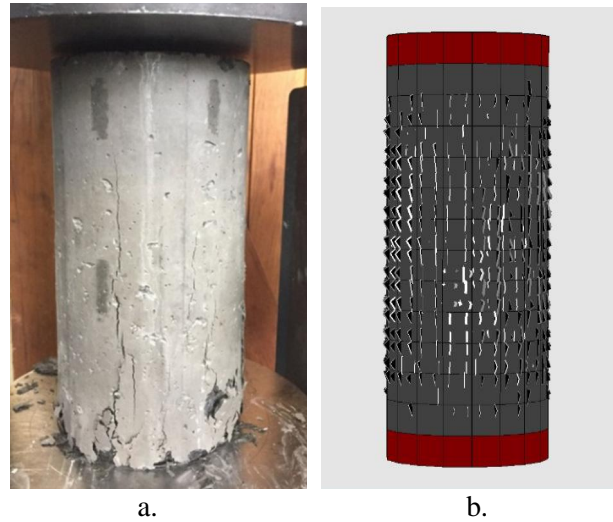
HSC cylindrical specimens. (a) Experimentally observed crack pattern after failure and (c) crack pattern prior to failure according to the numerical model.
